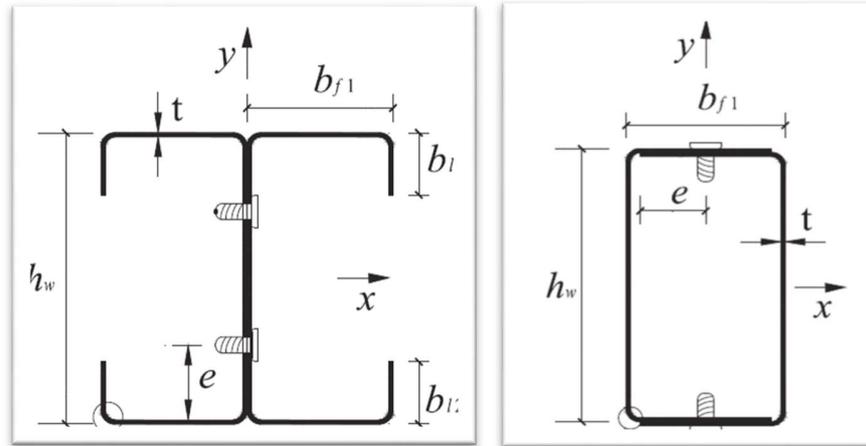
Cross-sections of the tested beams by Wang L (2018). [6]
